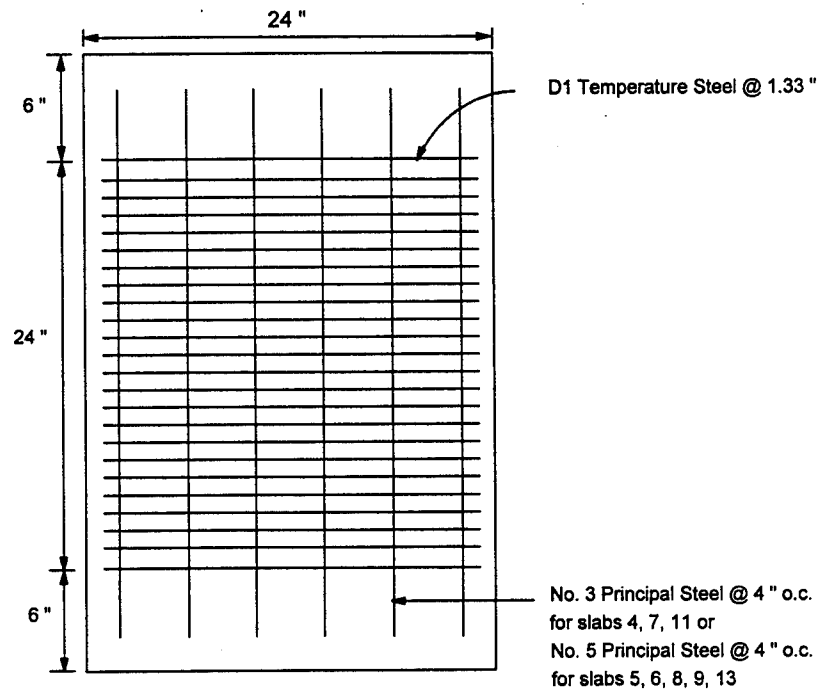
Plan View of Slabs No. 4, 5, 6, 7, 8, 9, 11, and 13
